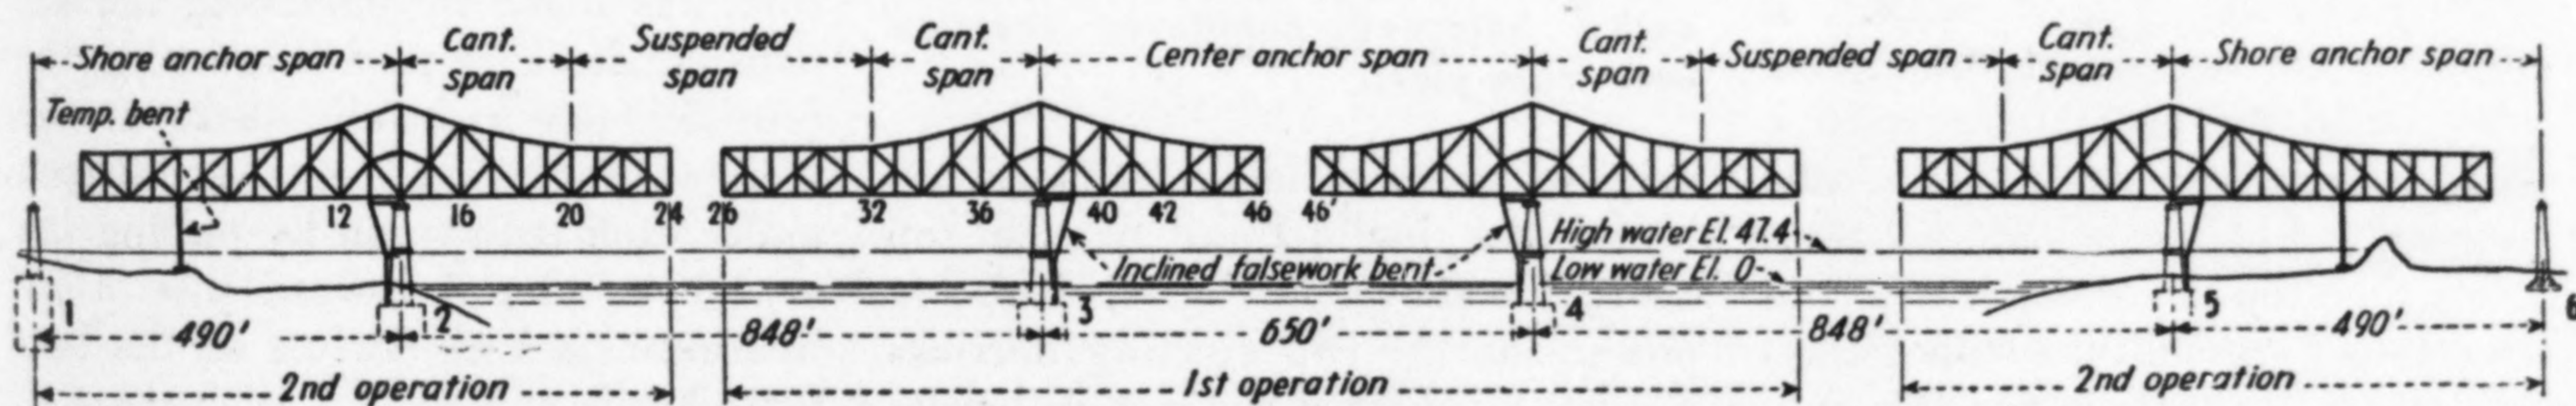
Elevation of main river crossing of Baton Rouge Bridge, showing stages in the balanced-cantilever erection scheme, which required no falsework in the river.
